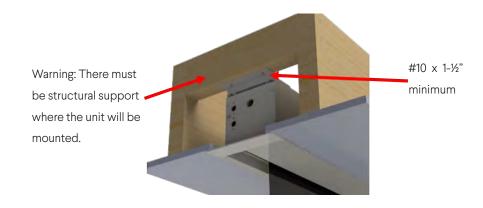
Cascade mounted to ceiling joists with Ceiling Mount
